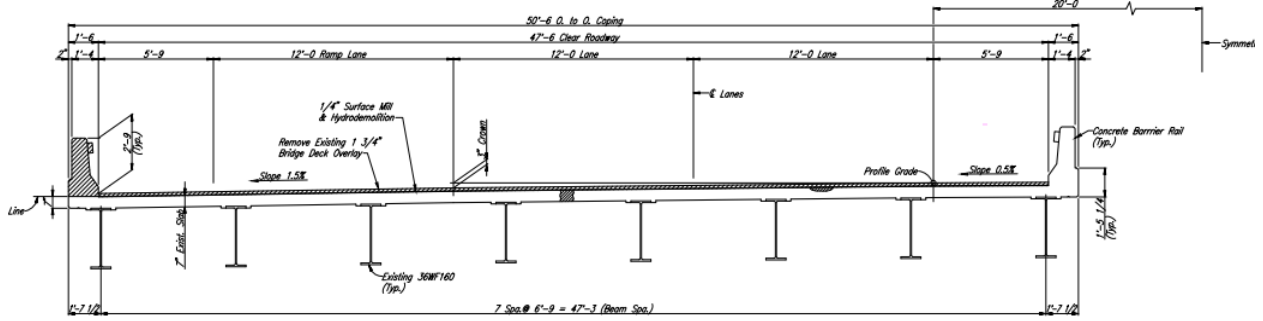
Typical Section of the Bridge (NBI 14280) (2014)
